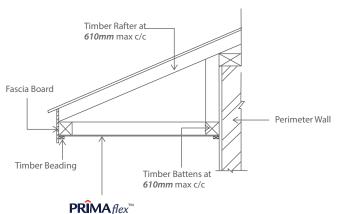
Flat Eaves / Soffit (for timber structure)
